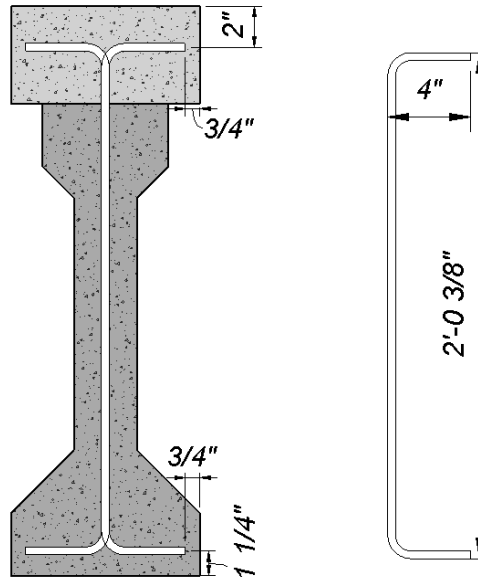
(Left) Stirrup Placement; (Right) Stirrup Dimensions
